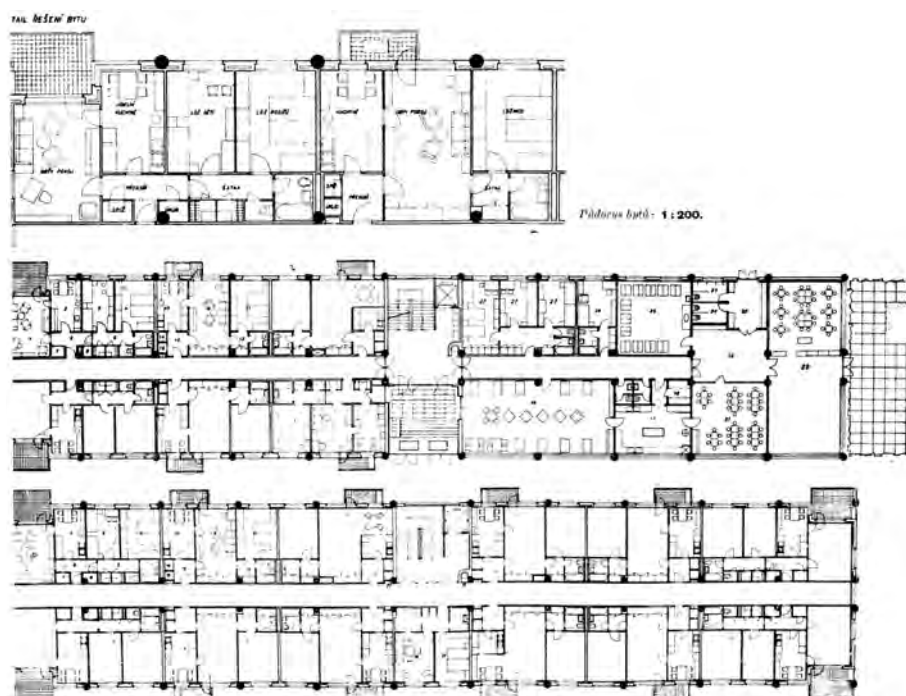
MIROSLAV DROFA, THE “MORÝS BUILDINGS,” 1946–1947.
